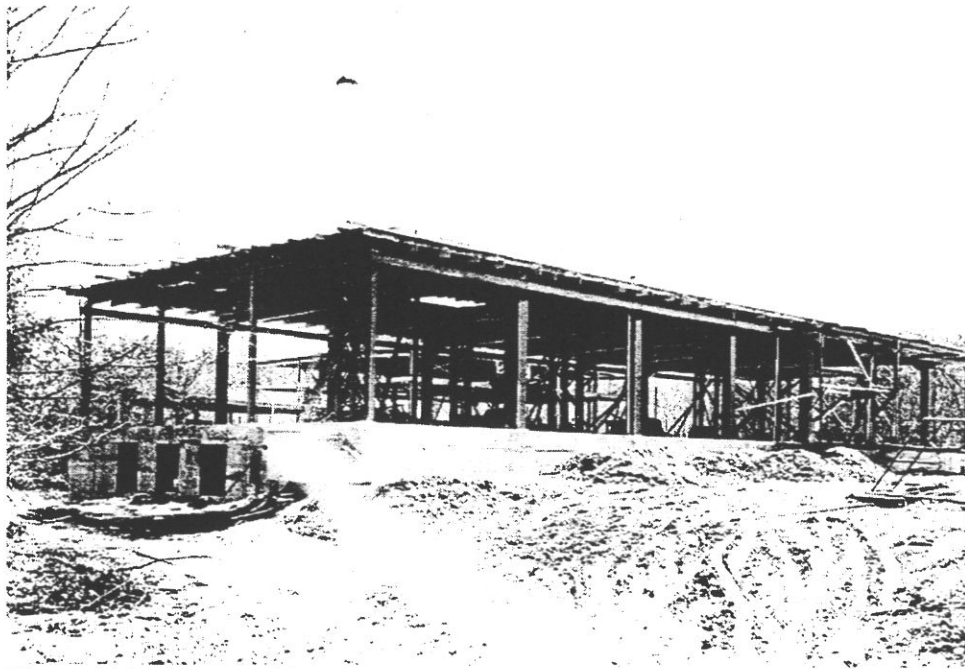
Garage and laundry, Building 13, looking southeast. March 21, 1941.
